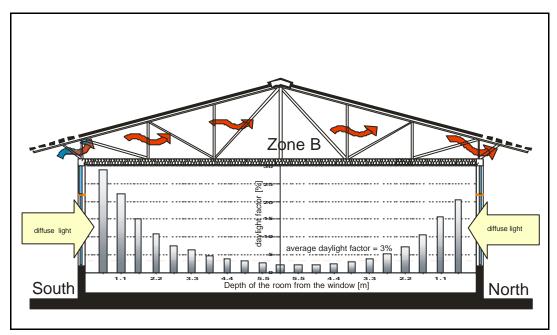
North – South section through the building showing illumination levels through the building due to overcast sky
